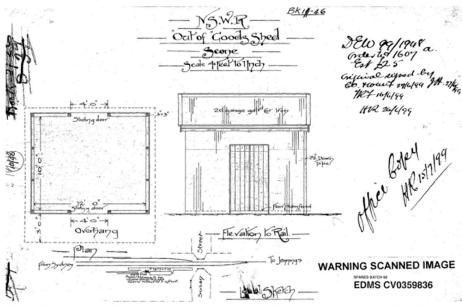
Example of dimensions of "Out-of" sheds, this example from Scone (Sydney Trains Virtual Plan Room)
